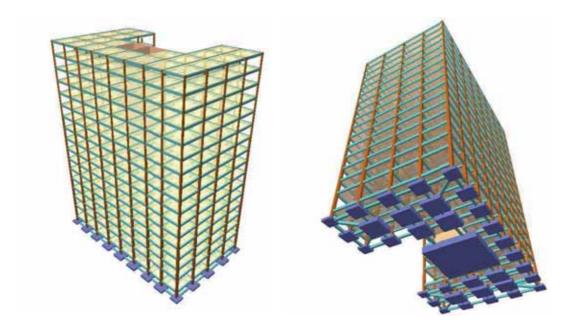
Three-dimensional sketch of the structure and foundations of the fifteenstory building. Source: CYPE v2011
